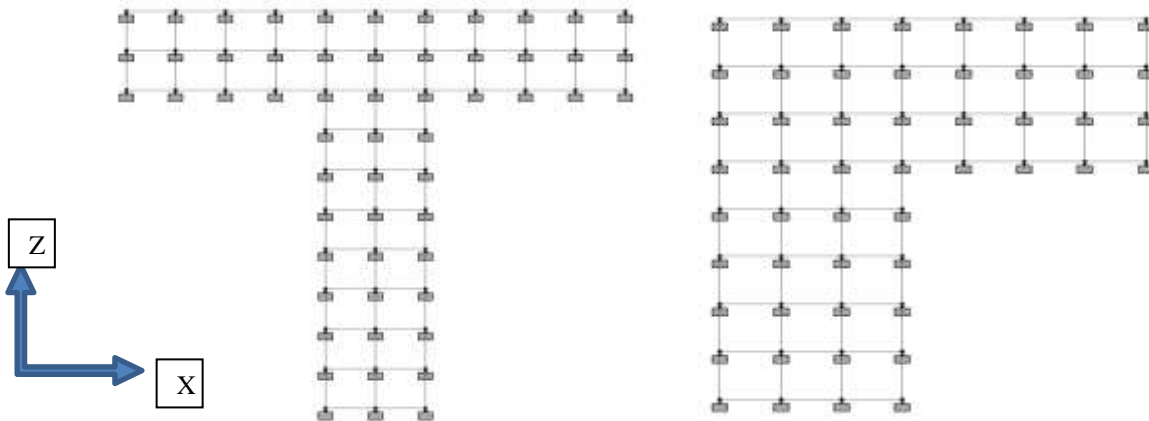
T shaped plan (Model-T) and L shape plan (Model-L)
